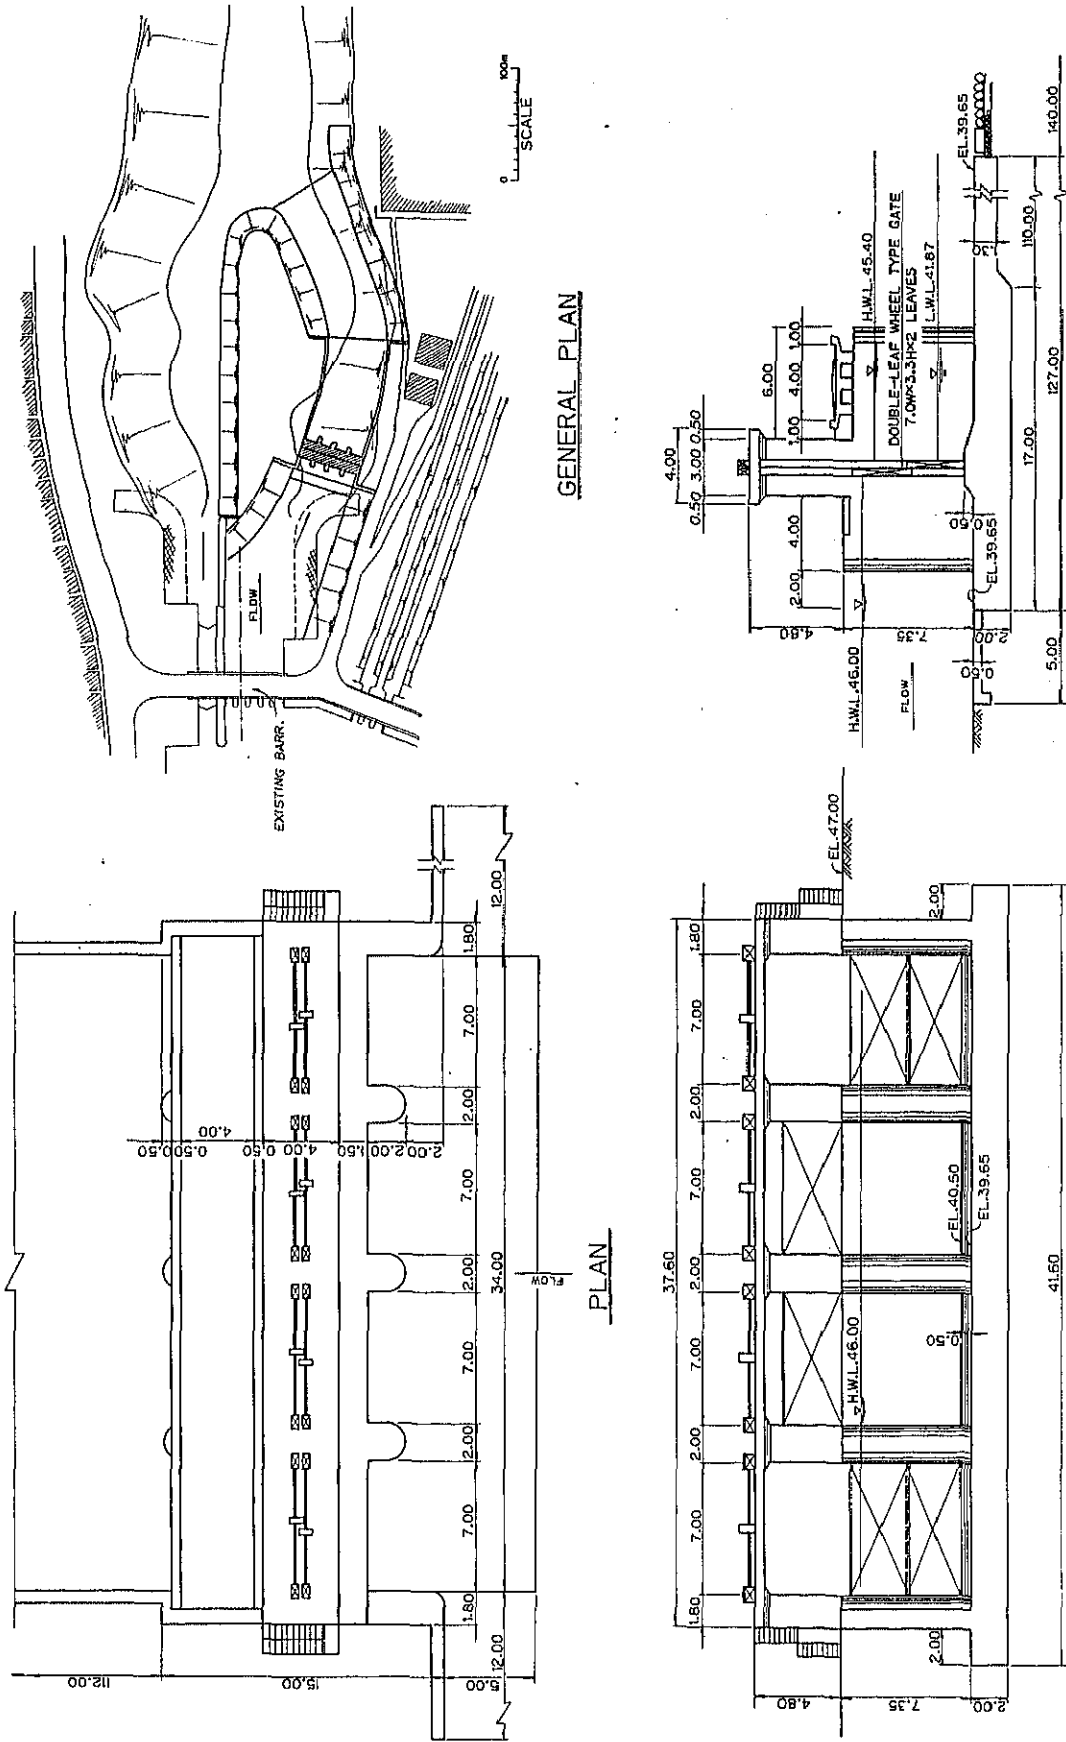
Proposed Plan of Manshat El Dahab Regulator
